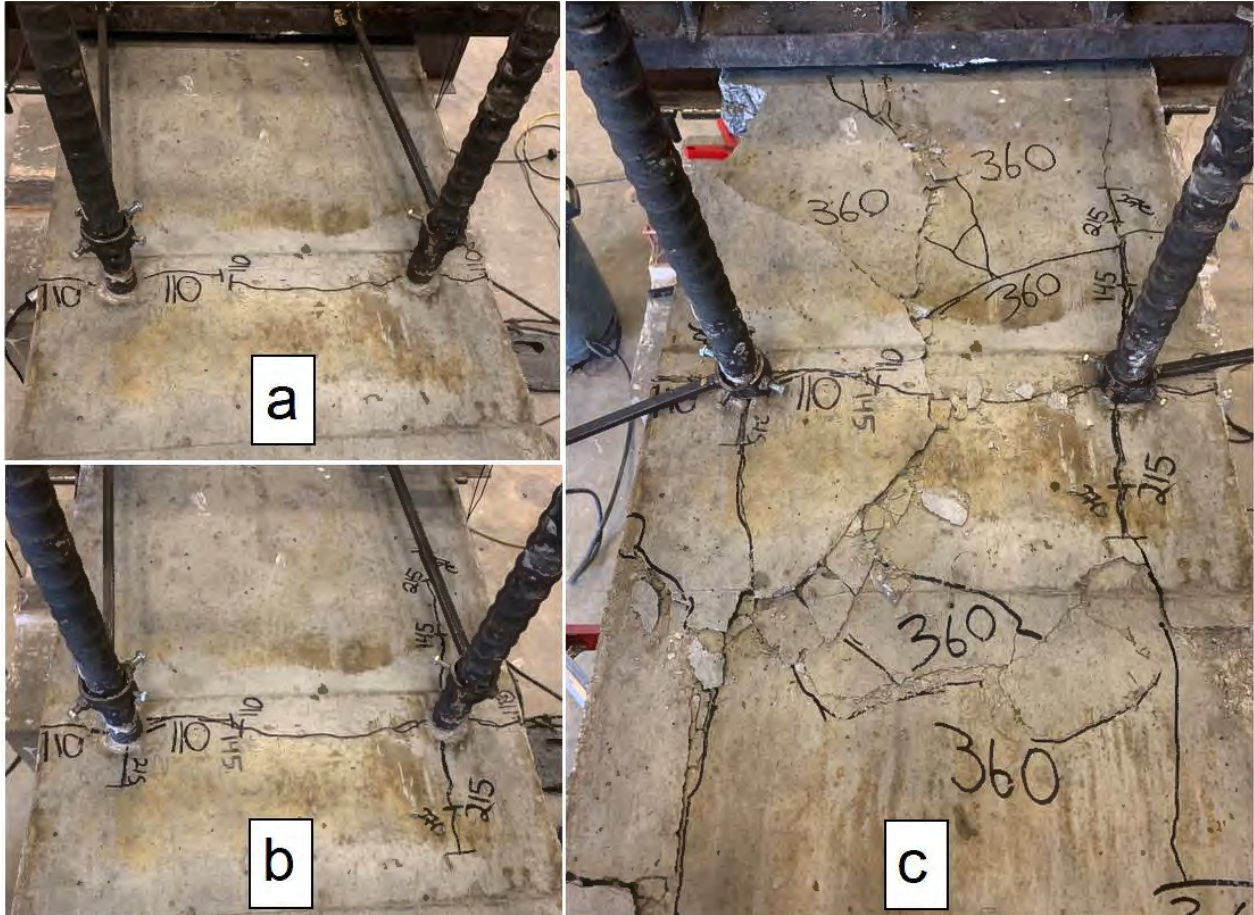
Example of cracking pattern in hooked bar specimens (front face, specimen H14-15): (a) Horizontal cracks likely initiating due to bar slip, (b) Cracks radiating from the hooked bars, and (c) Cracks radiated from the hooked bars connected to each other along with local concrete damage
